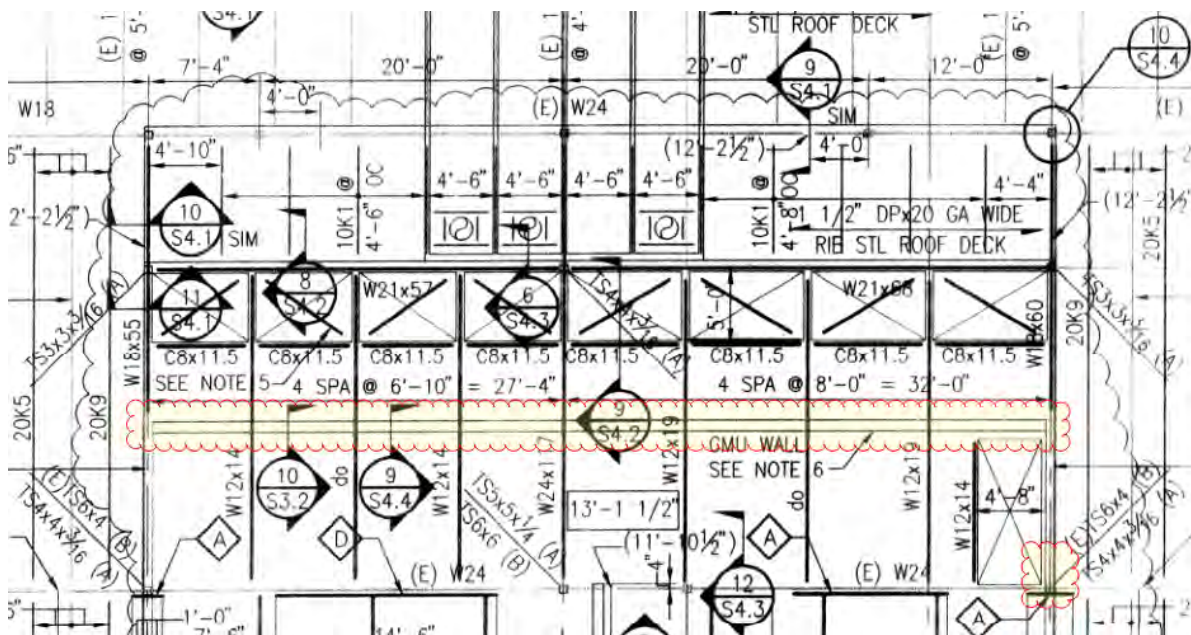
Central mechanical floor, 1999 renovation and addition drawings, sheet S2.3. The CMU to beam connection in question is clouded.
